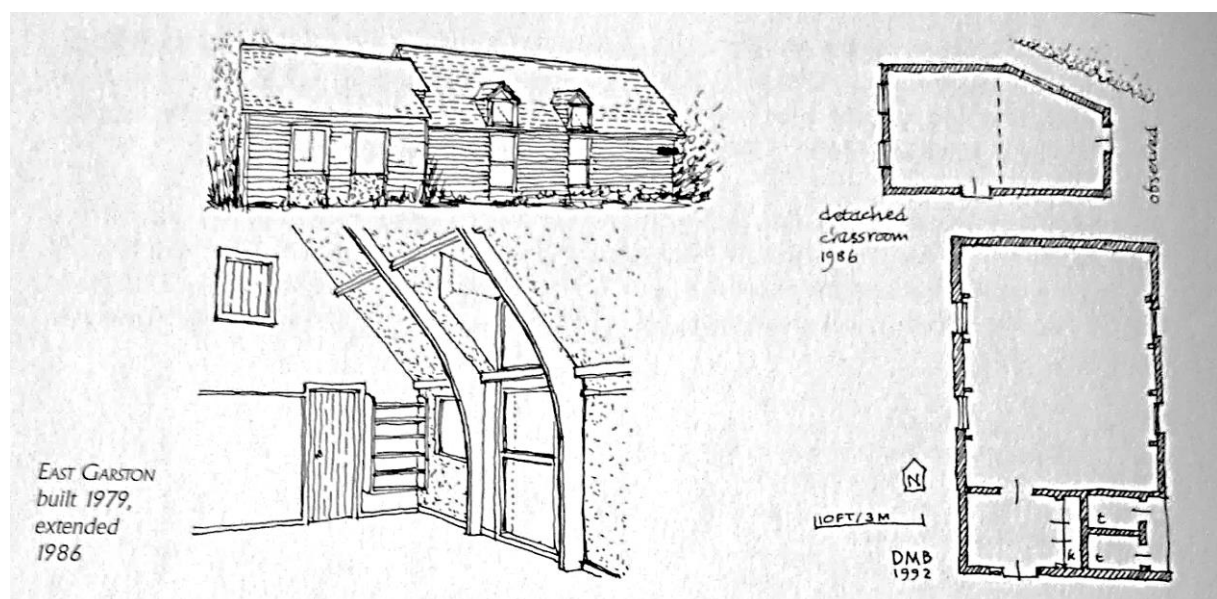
Perspective, detail and plan (north is to the right; not to scale)
